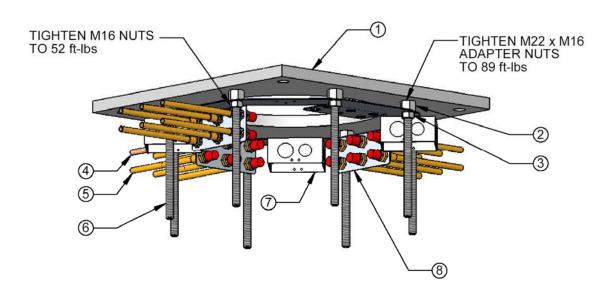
110106 Mounting System Components (see drawing 110106 for complete rough-in)
